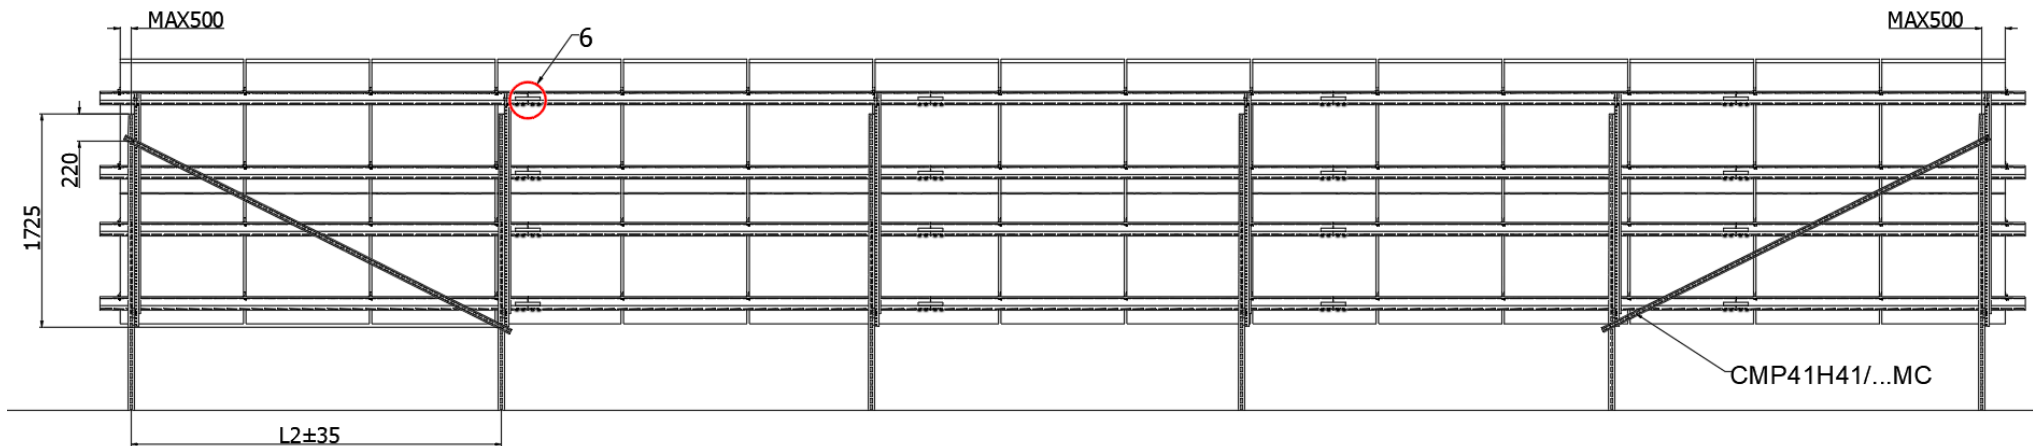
View of the structure from the north side with bracing spacing No. 2
